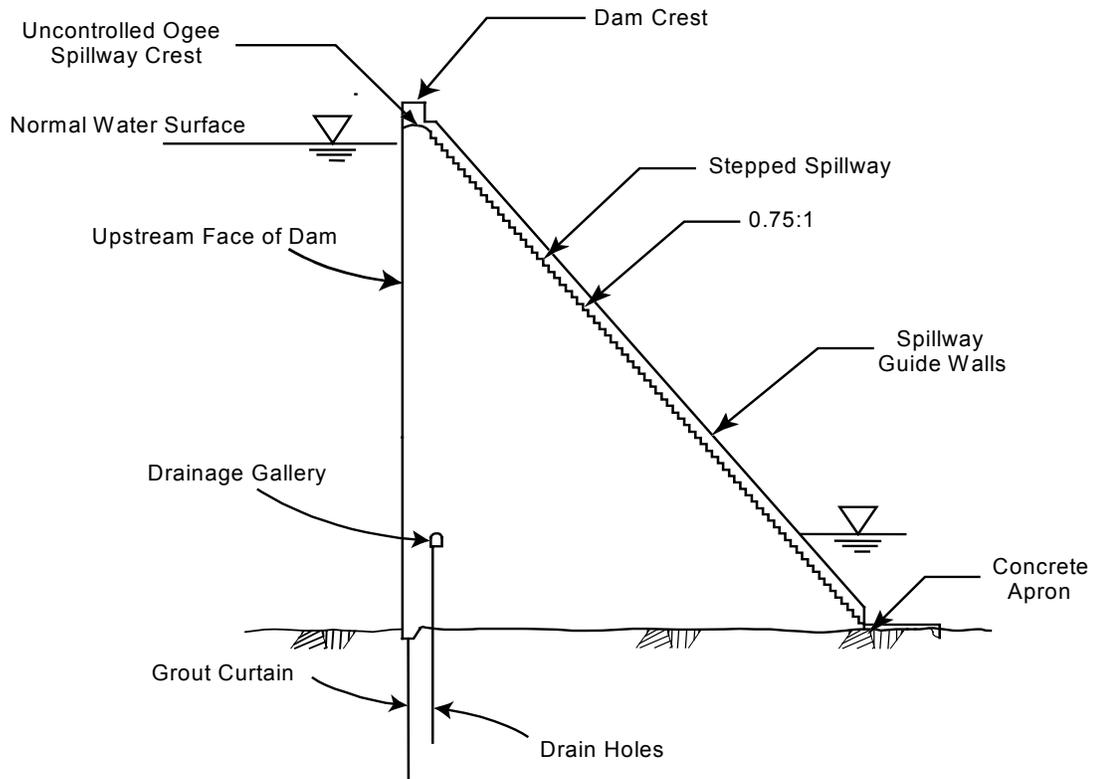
RCC GRAVITY DAM CROSS SECTION
